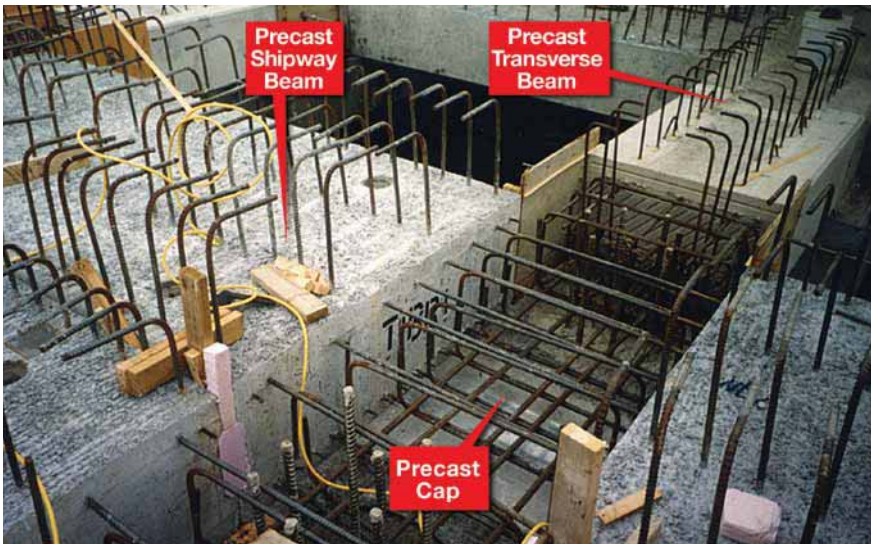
Closeup of construction showing crane beam closure. Photo courtesy: Guy F. Atkinson Construction Company.
